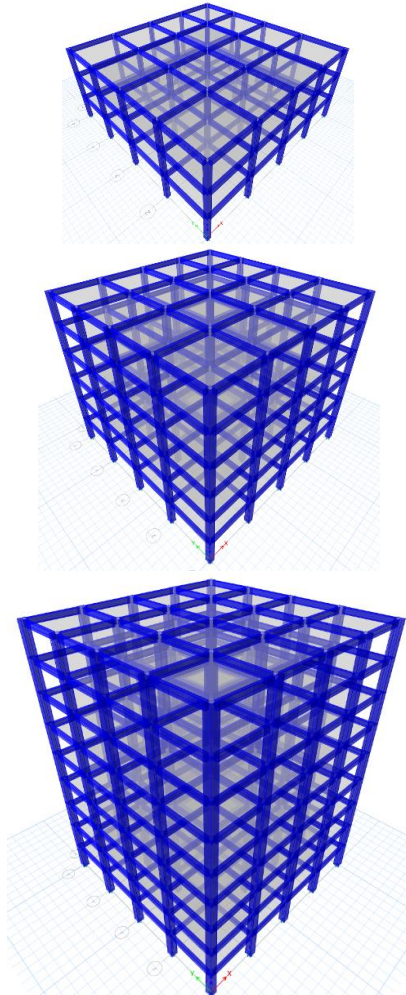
3D models of buildings (3, 6 and 9-storey)
